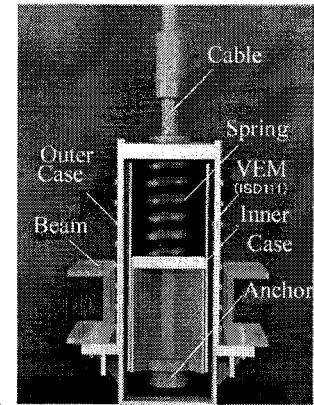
shows the Sizuoka football stadium "Ecopa" (Kaneda et. al. 2001). In this studium,the large cantilever roofs are supported by back-stay cables and front cables, and a visco-elastic damper with a paralell spring as in Figure 10(c) is inserted in each anchor of the front cables in order to reduce the vibration due to wind and earthquakes. A detailed site experiment was carried out after the completion of its construction. The time histories for one of the free vibrations without and with a damper are shown in Figure11 (a) and (b), respectively. Due to the dampers, the damping ratio was estimated to increase of from $\eta=1\%$ to $\eta=4\%$
